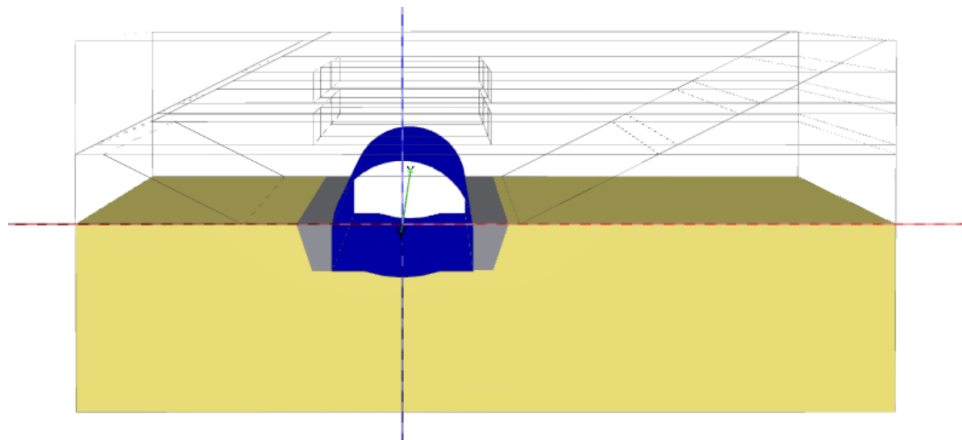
Cast-in-situ tunnel lining positioned in excavated trench with concrete side walls.
